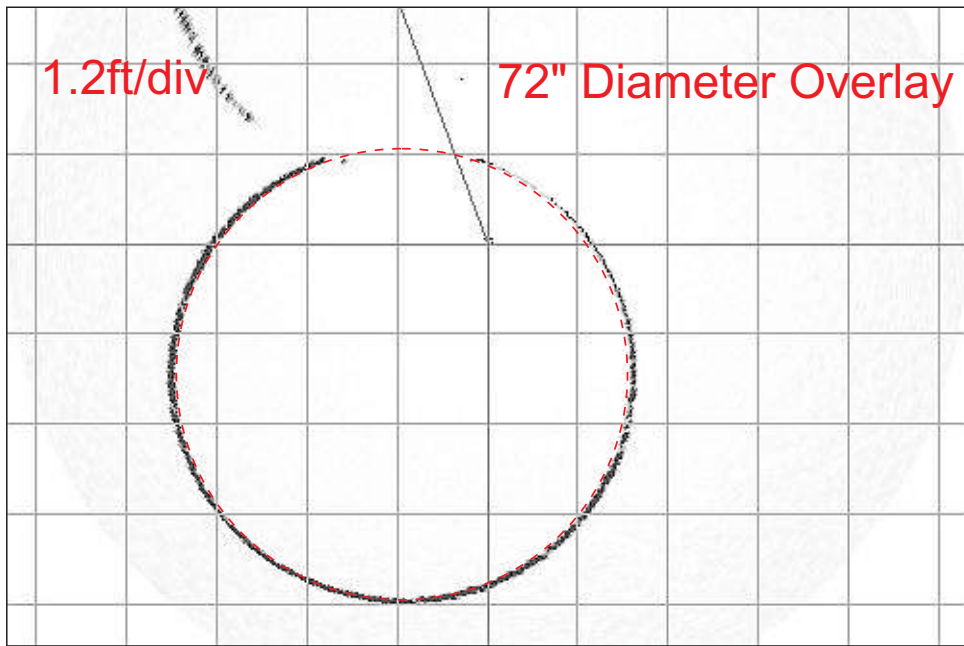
Sonar Profile 8 - 437 feet downstream of Access Point 1.
